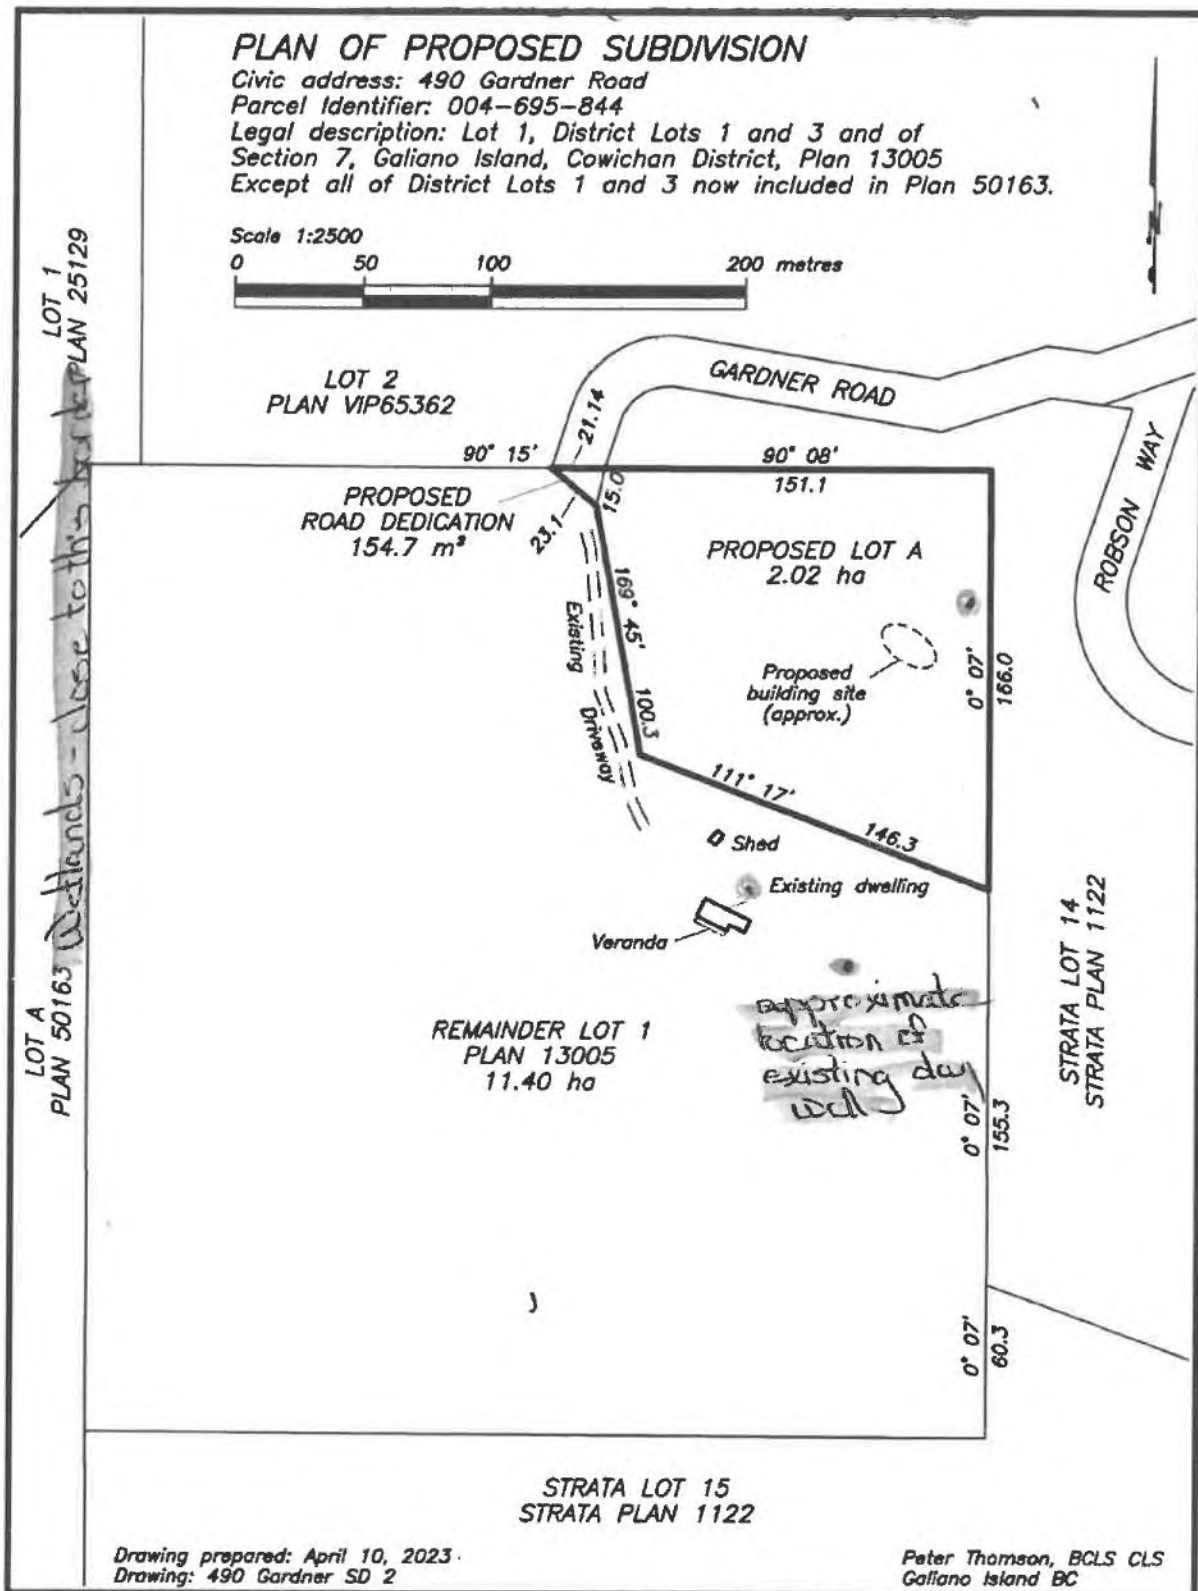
Draft plan of proposed subdivision. Adapted from Thomson (2023).
